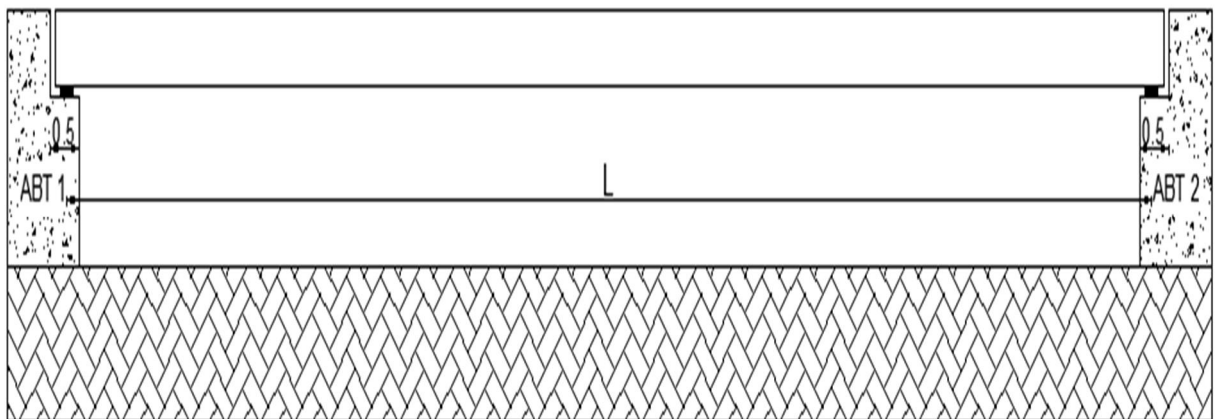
Longitudinal Section of Voided Slab & Box-Girder Railway Bridge.
